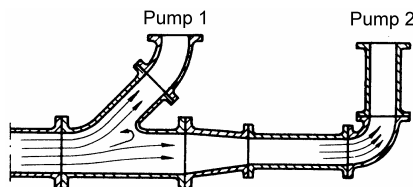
Correct pipe arrangement for two similar pumps with a common inlet pipe
